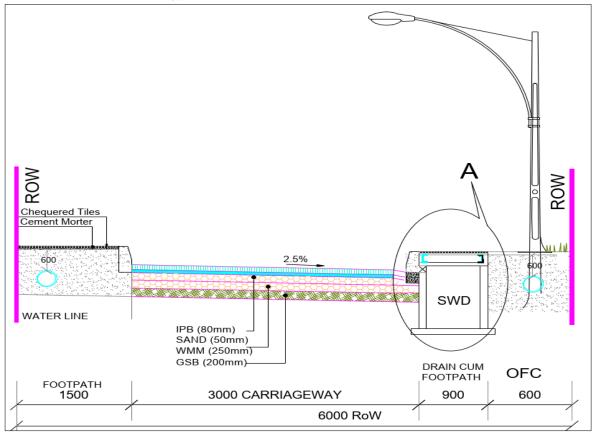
Typical Section of Proposed Road Network within Dukli IE
